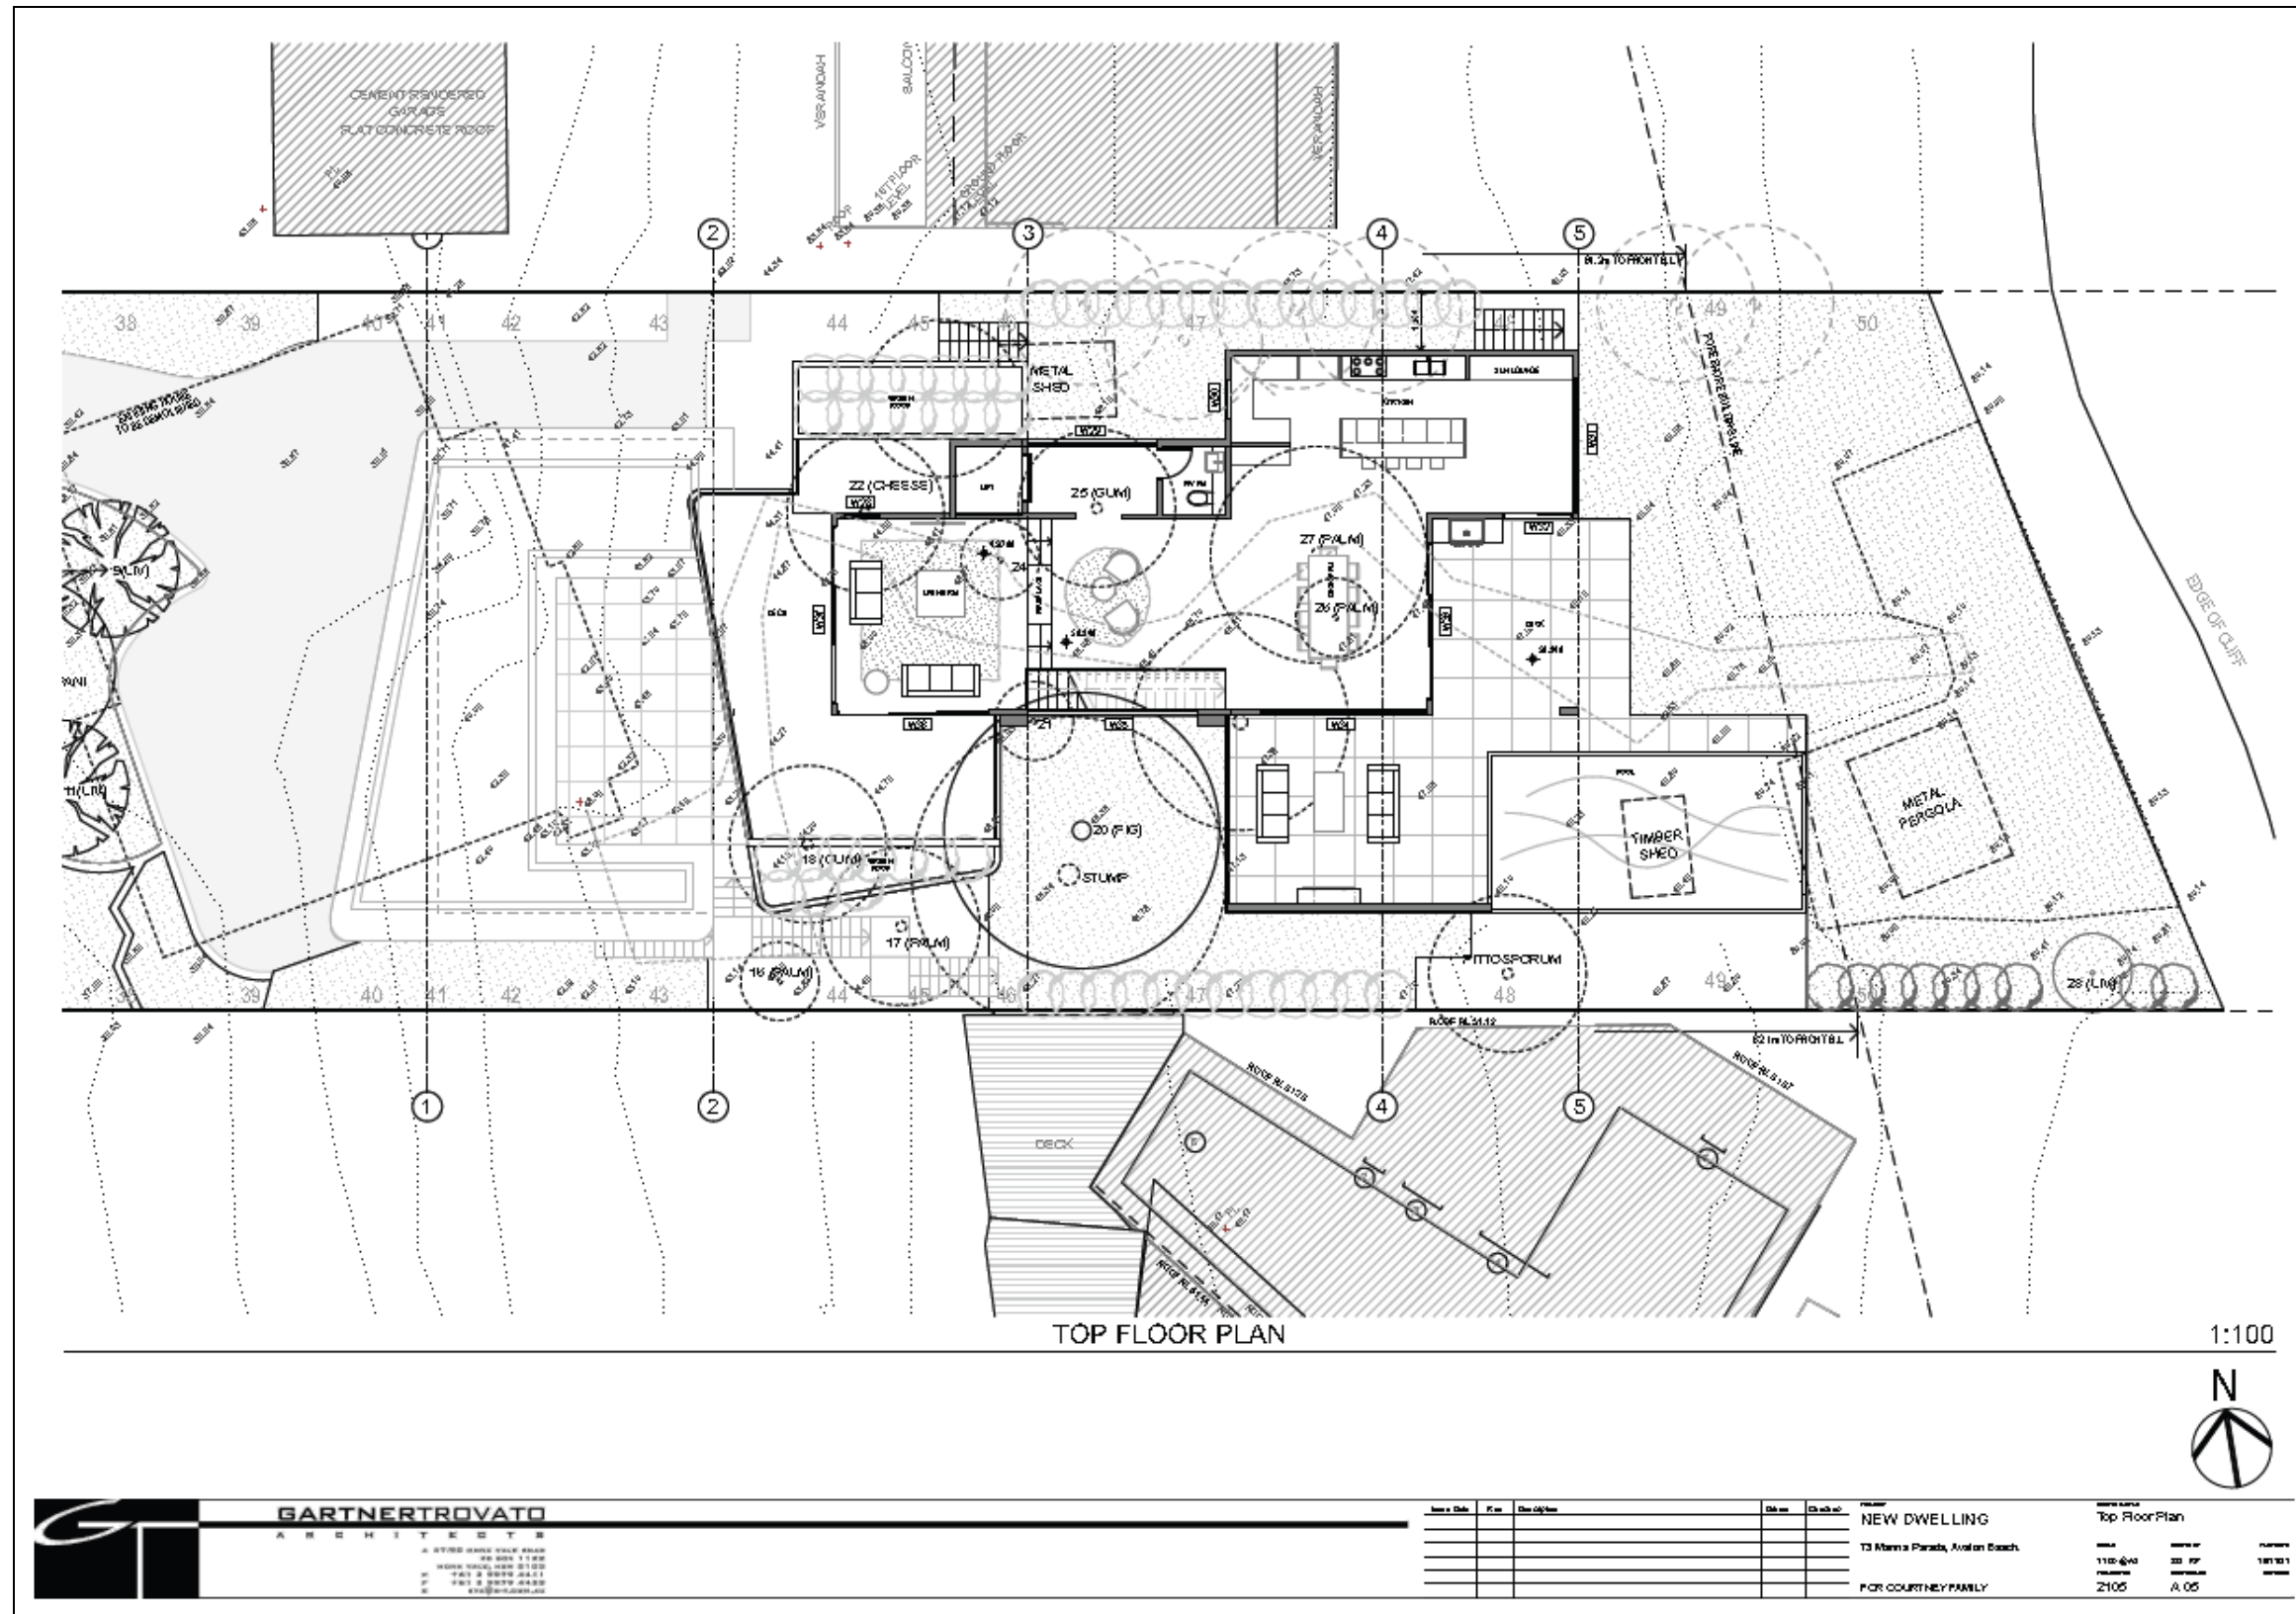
Page 13 illustrates the proposed SITE PLAN, Page 14 illustrates the proposed CARPARK FLOOR PLAN, Page 15 illustrates the proposed GRANNYFLAT FLOOR PLAN, Page 16 illustrates the proposed FLOOR PLAN, Page 17 illustrates the proposed TOP FLOOR PLAN
